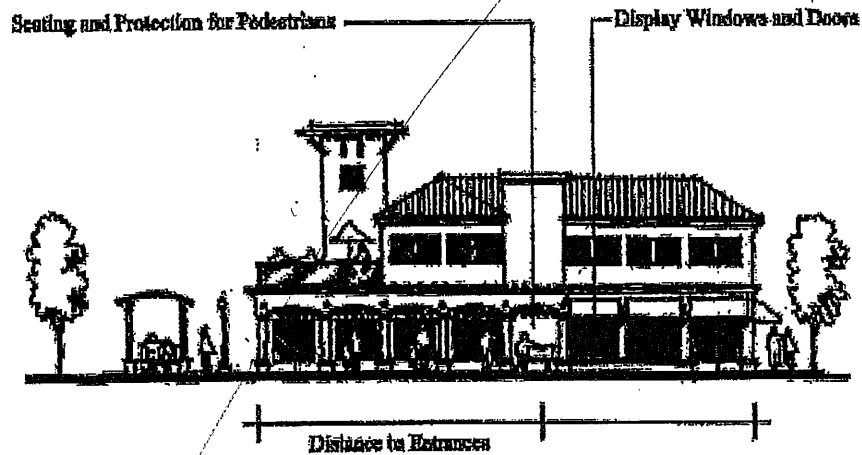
B(1) - (Downtown / Main Street) Building Design Elements (Typical)
